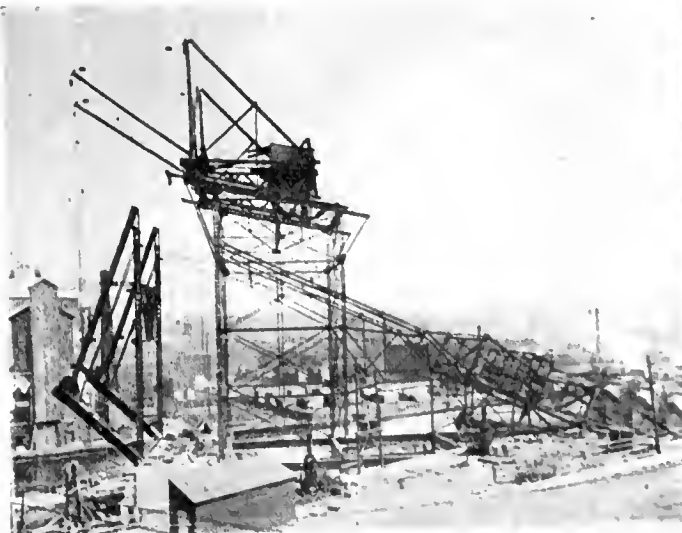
Traveller on Steel Tower erecting end panel of Arch
